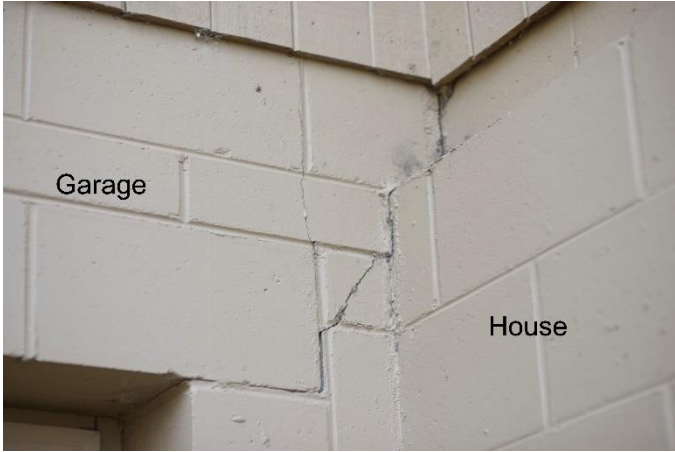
Cracking in Foundation Joint Between House and Garage
